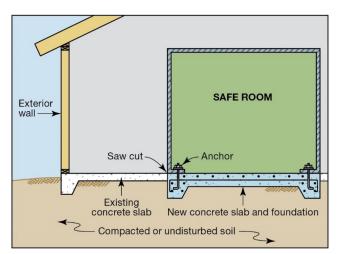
New concrete slab foundation that has been designed to meet the requirements of FEMA P-361 and ICC 500 Section 307
